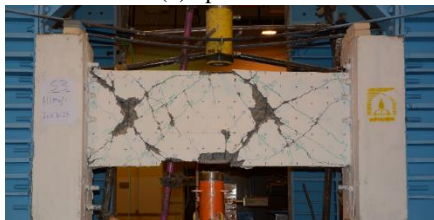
shows the beam SM is subjected to a monotonic load, the first diagonal crack occurred at 108 kN. As the loading increased, new cracks occurred and existing cracks extended. Finally, the maximum bearing load of this beam was 511 kN.
